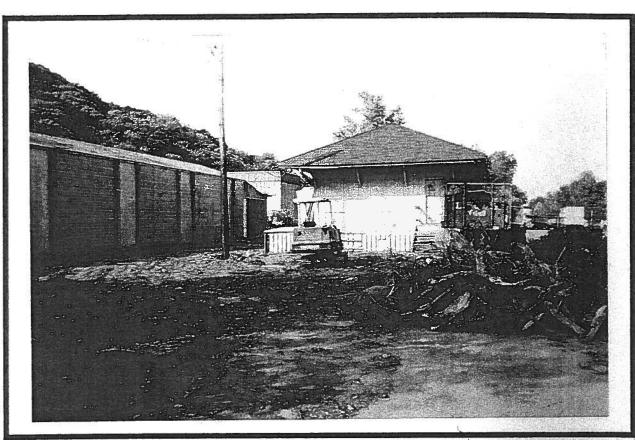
Old Depot Excavated Area. Changes Shown Since 9/9/93 Photos (Photo 1 of 4)
